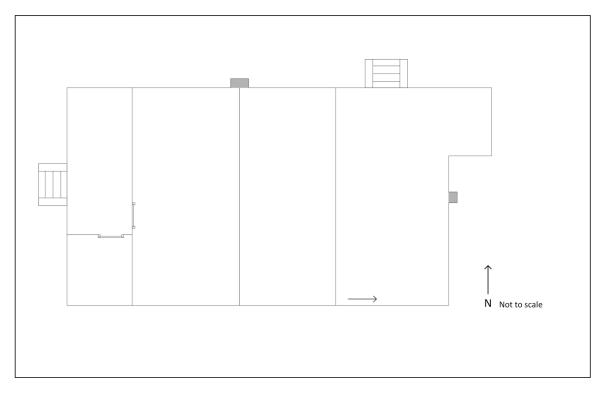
Floor Plan – Malcolm Jernigan House.²⁰
